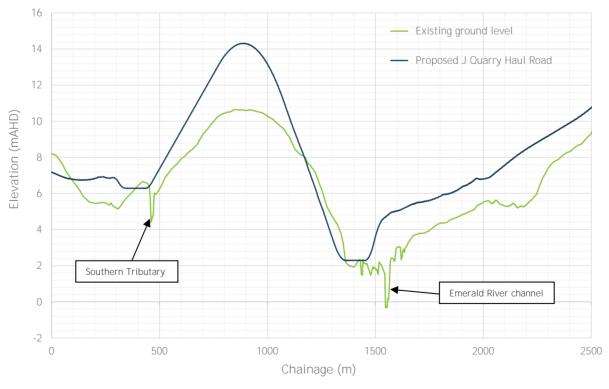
Emerald River floodplain cross-section along Haul Road alignment
